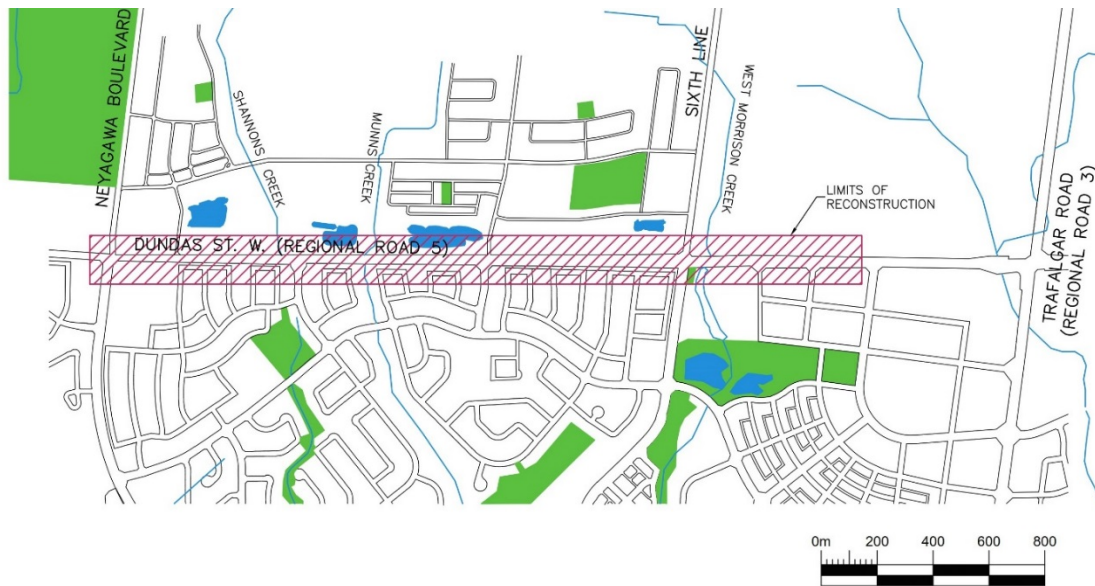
Dundas Street Study Limits (Amec Foster Wheeler)
